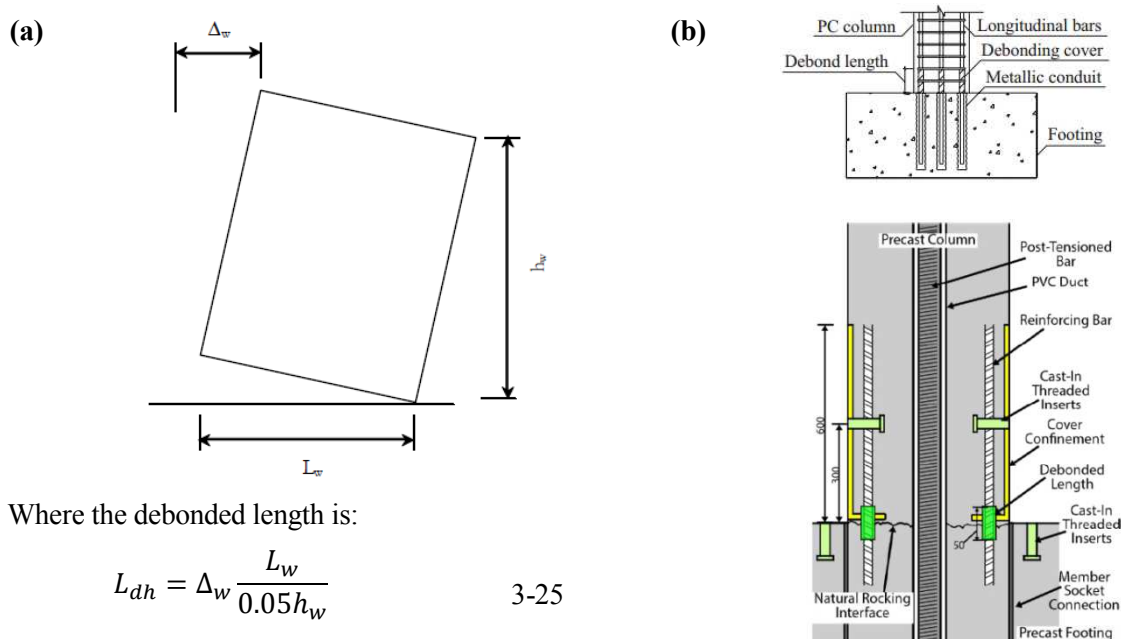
Diagrams showing debonded reinforcement in modern design: (a) example calculation used for precast concrete panels (SESOC, 2012); (b) base connections for RC bridge columns (White, 2014).
